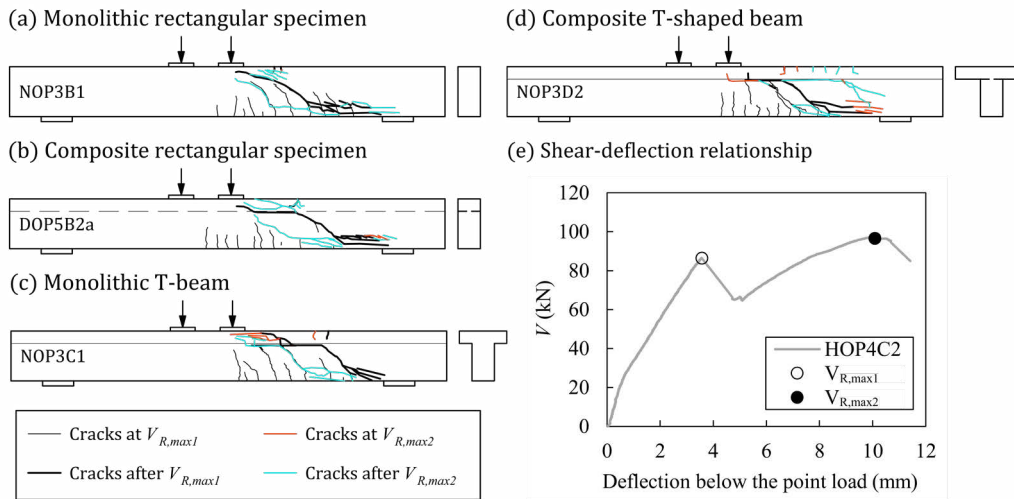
Examples of crack patterns of beams without web reinforcement and example of shear-deflection curve: (a) monolithic rectangular specimen; (b) composite rectangular specimen; (c) monolithic T-beam; (d) composite T-shaped beam; (e) shear-deflection relationship for the specimen HOP4C2 differentiating between  $V_{R,max1}$  and  $V_{R,max2}$  (adapted from [23]).
